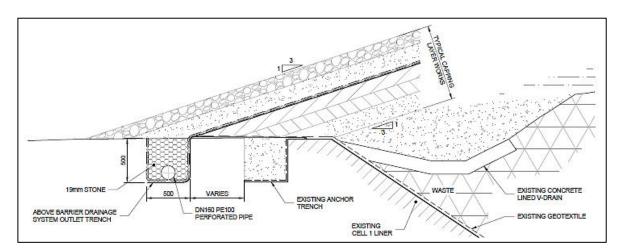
Above liner drainage system outlet trench (Drawing 02-T-1228)
